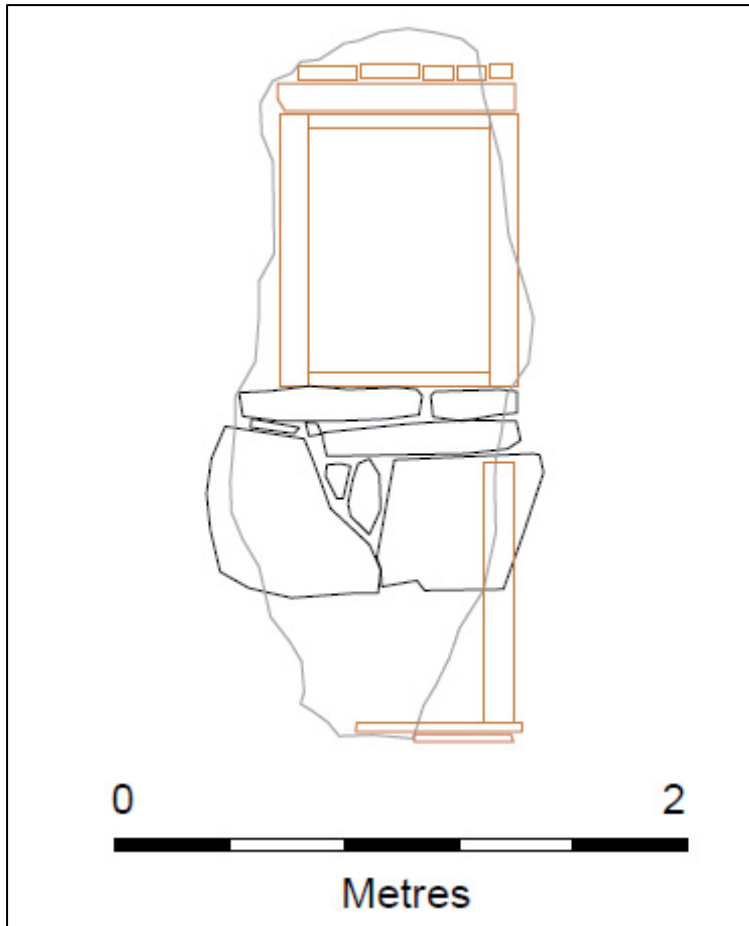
A measured elevation of the junction between the western adit and the eastern drive, viewed from the west and showing the timber framed 'doorway' and stone wall which were found at the connection. The profile of the tunnel at the junction is shown in grey. The lower timbers were found immediately to the west of the walling.
